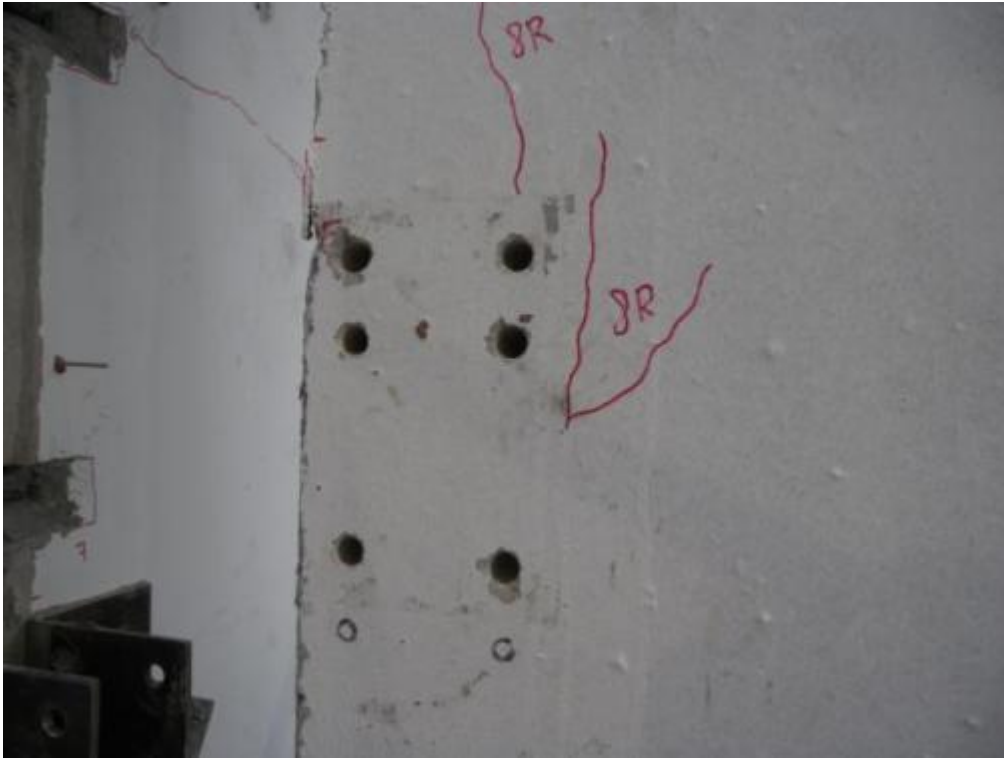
Ground-floor stability wall panel – Detail of cracks at approximately mid-height, South edge.
